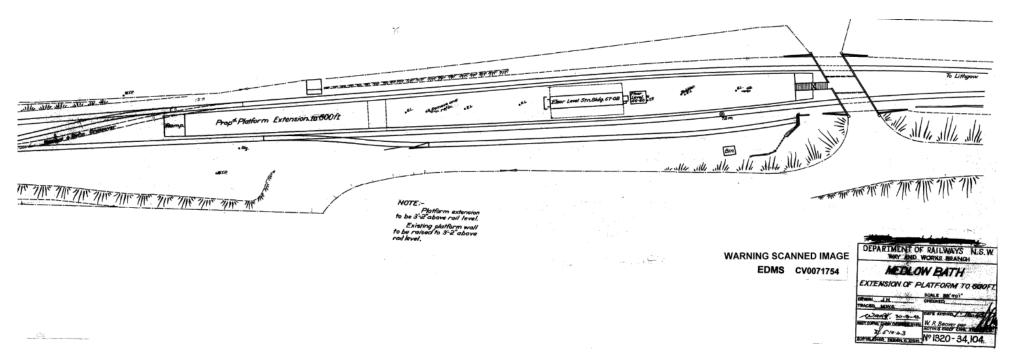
"Medlow Bath extension of platform to 500 FT." Department of Railways NSW Way and Works Branch. 1943. Sydney Trains Plan Room No. CV0071754
